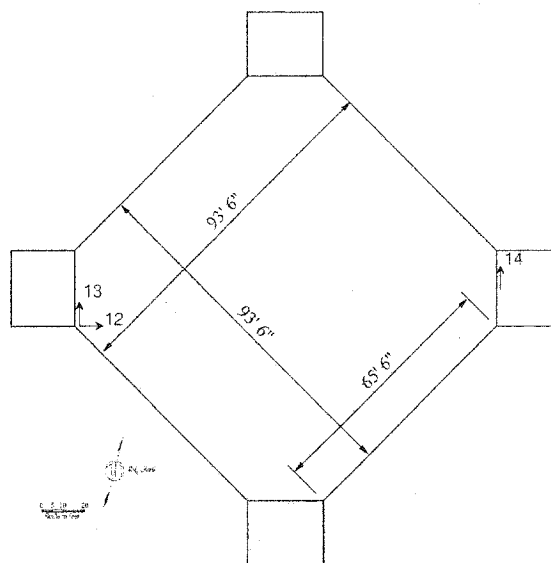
Sensor Locations (Channels 12, 13, 14) in Roof (3. Hao, A9.1.5)
